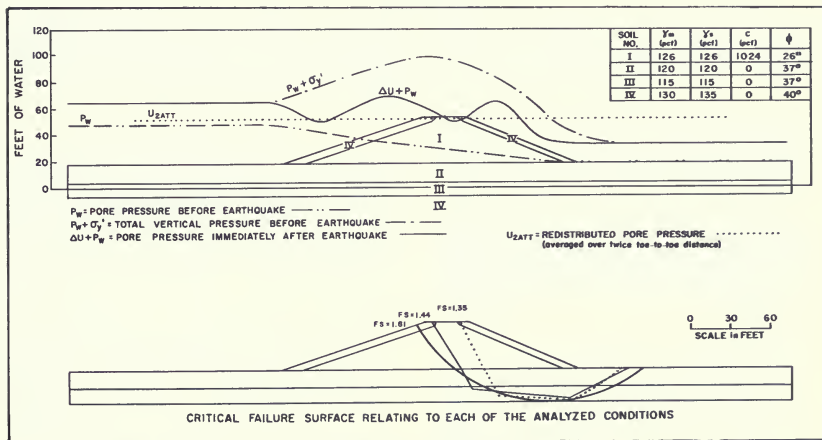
Post Earthquake Stability Analyses (Downstream) for Model 2—Station 165 (Worksite 2)—Reservoir Elevation = 136.5 feet
